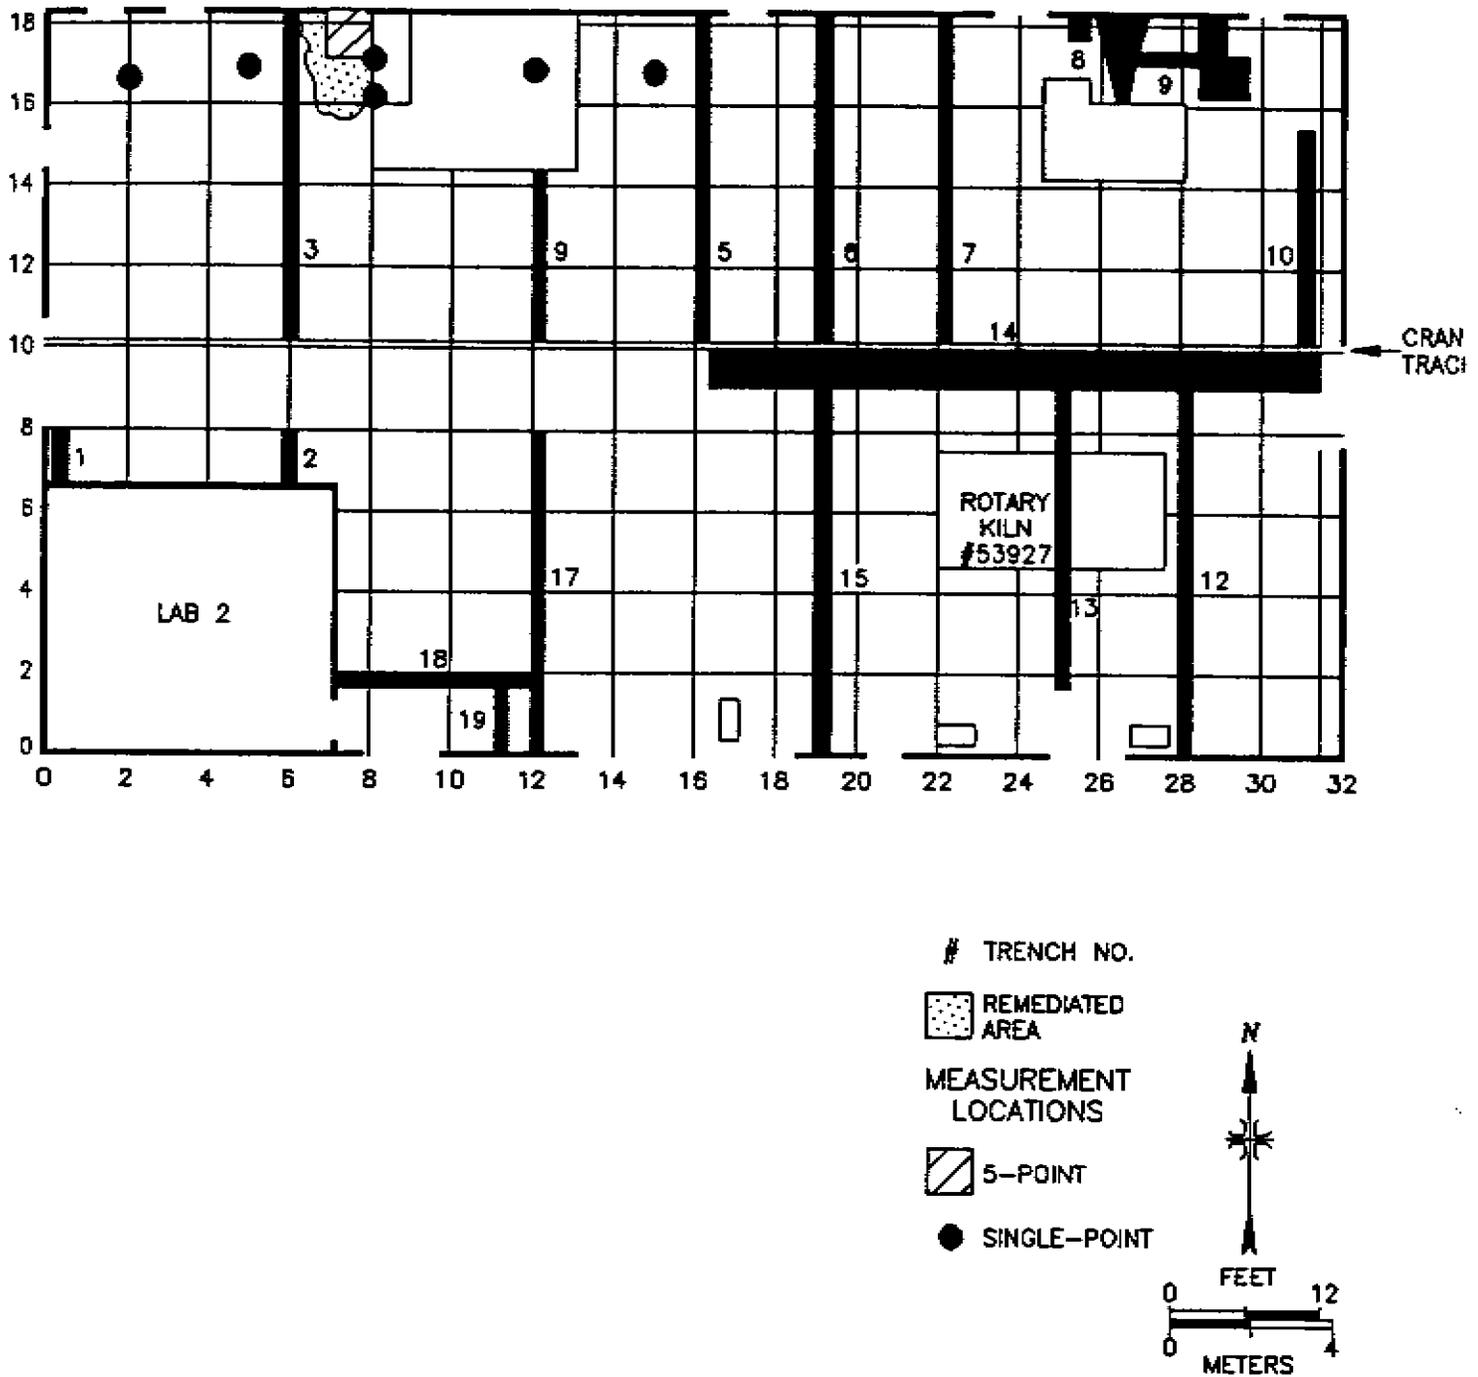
Building 23, Lab 1, Indicating Measurement Locations on the North Floor
